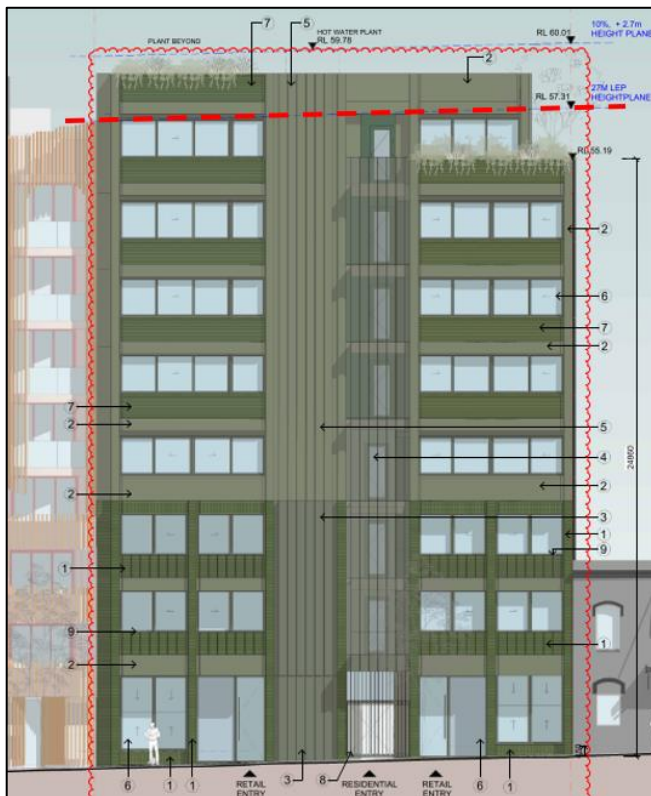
Cooper Street elevation of the proposed building showing the 27m height control in red dash
